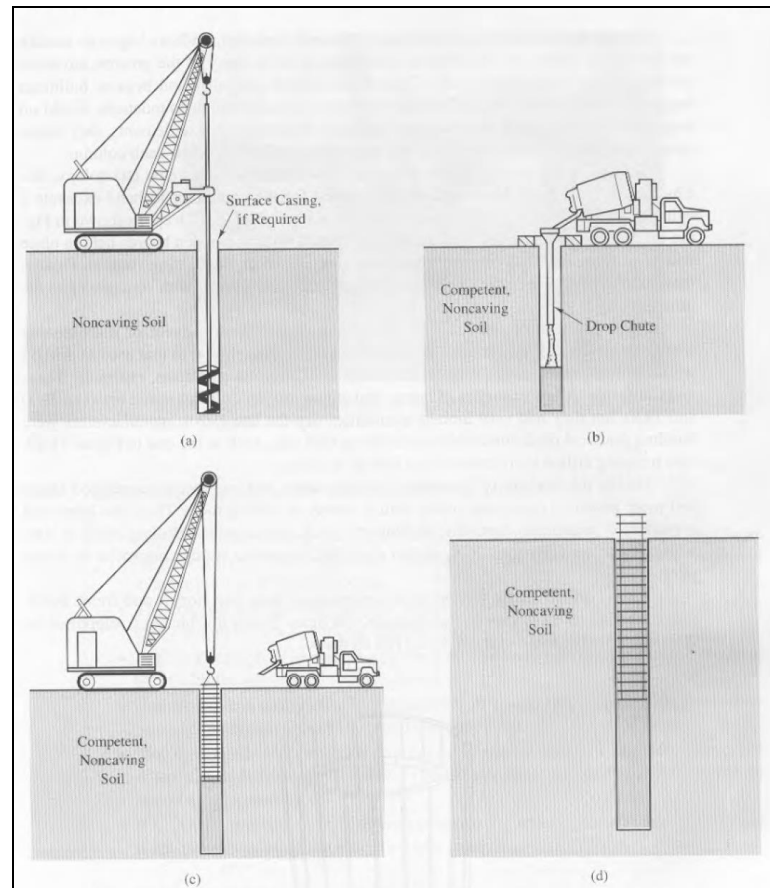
Drilled shaft construction (dry method): a) Drilling a bore; b) Concreting the bottom of the shaft; c) Placing steel reinforcements; d) Finishing the concreting (Coduto, 2001)
